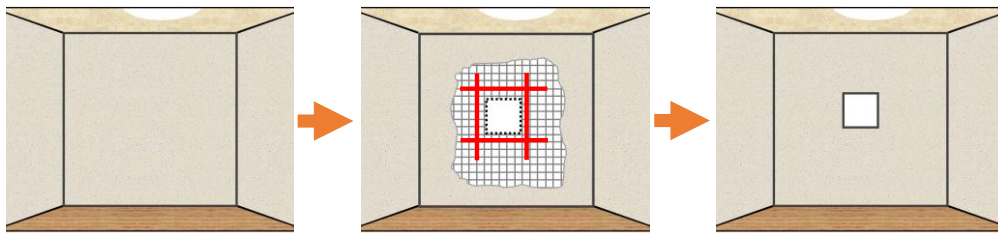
Standard procedure for adding reinforcement around opening in existing shear wall
